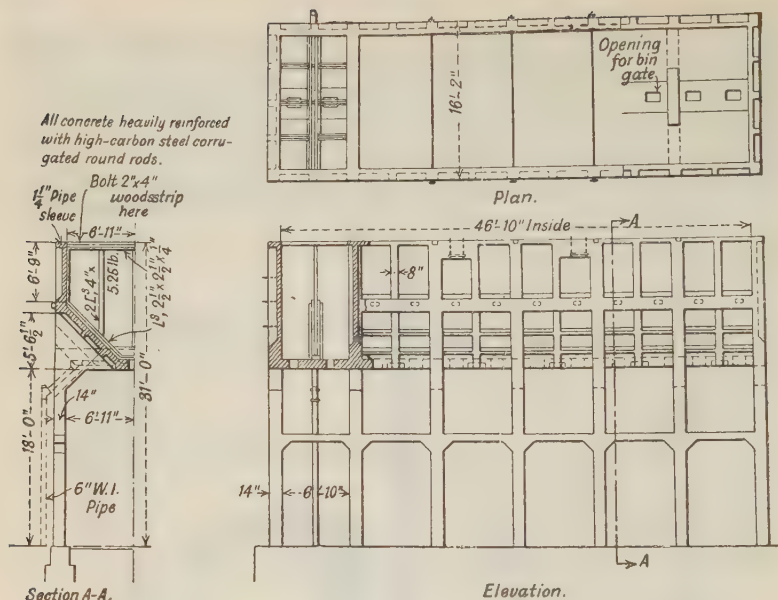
Reinforced-concrete tailing bin, St. Joseph Lead Co.
